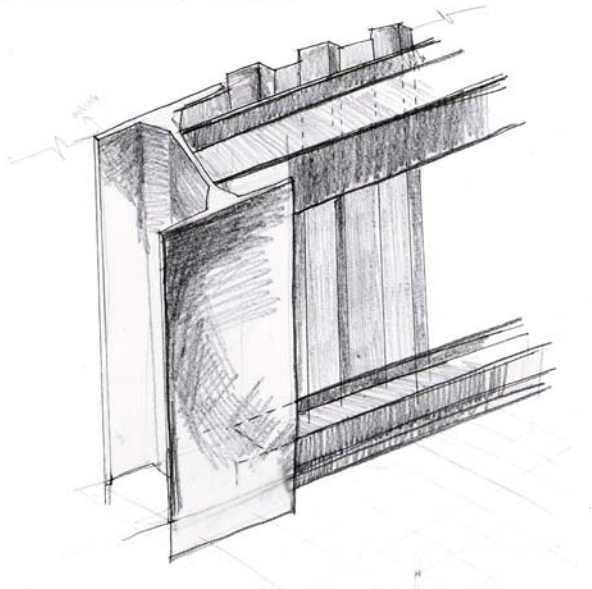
Fixing of IBR sheeting to main steel structure. View from inside
